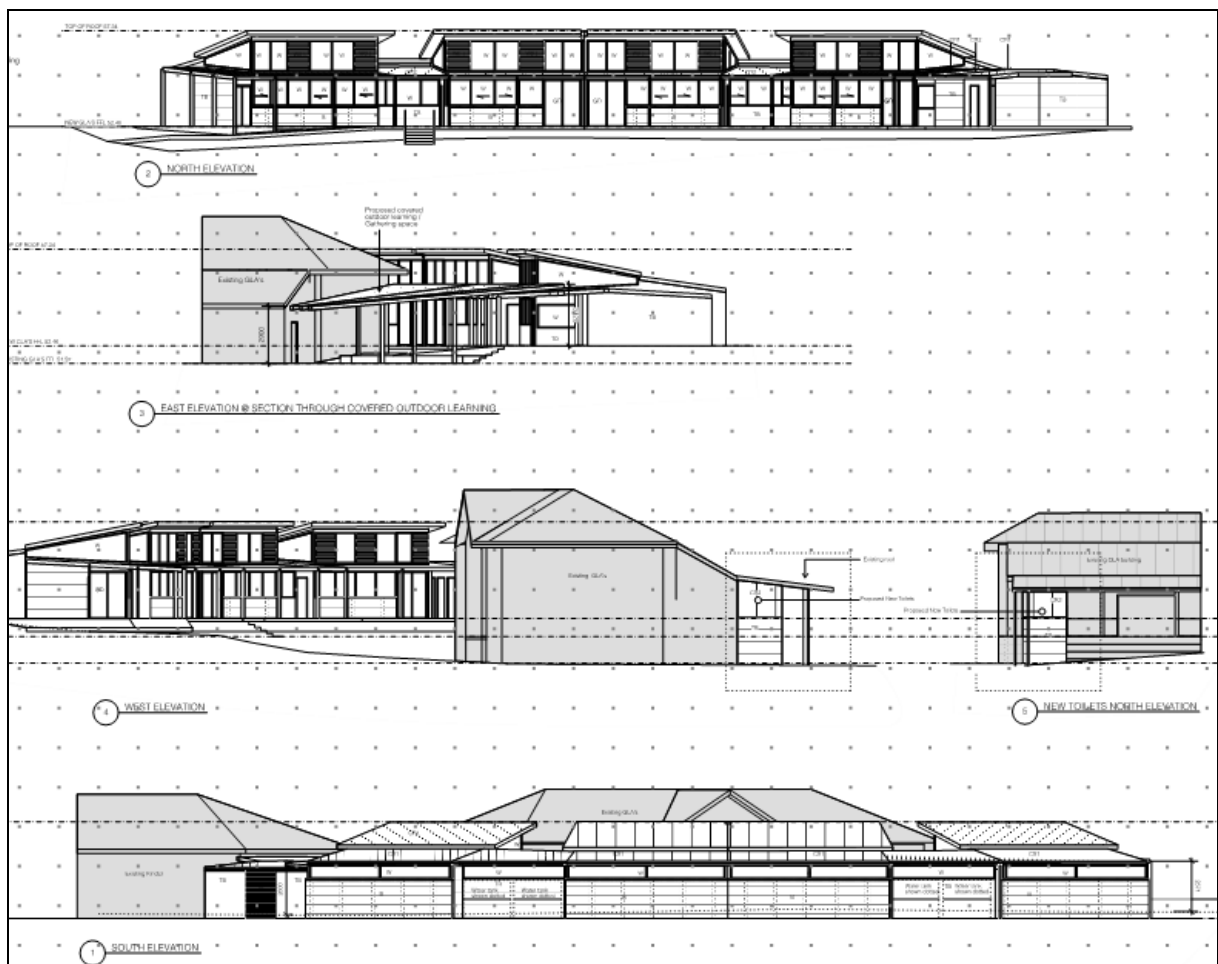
New building – containing 4 classrooms and associated teaching areas
